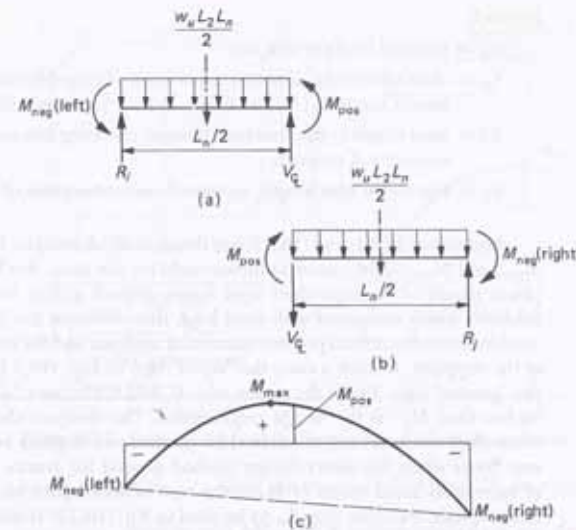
Statics of typical exterior panel in a two-way floor system.
